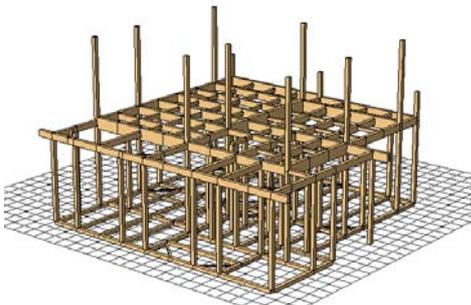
Framing plan of pillars and wallsin a new two-story wooden house, O-house
